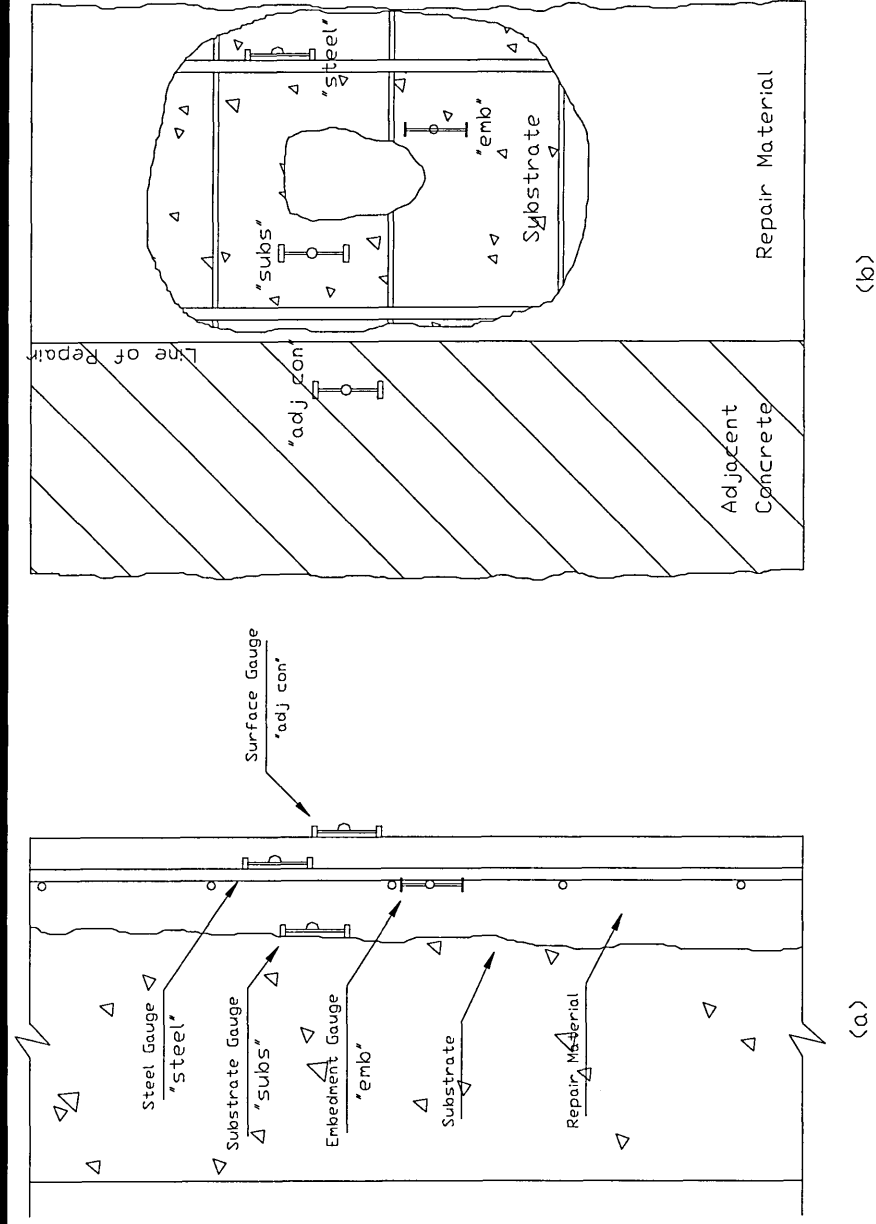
Position of gauges within a typical repair patch at Gunthorpe Bridge
